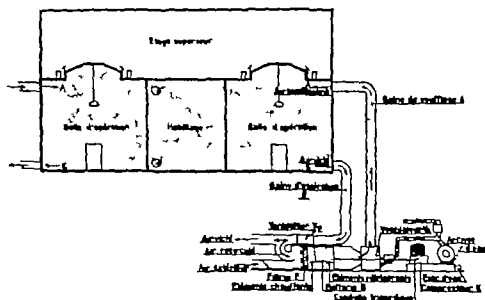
Cuneo's air-conditioned surgical block. Shaded areas are air-conditioned. Fresh air drawn through filter F and over refrigerating and heating element, and carried into operating room through opening A in ceiling. Vitiated air drawn through exit E at floor of room. Thermostat and hygrometer regulate temperature and humidity (Roux)
